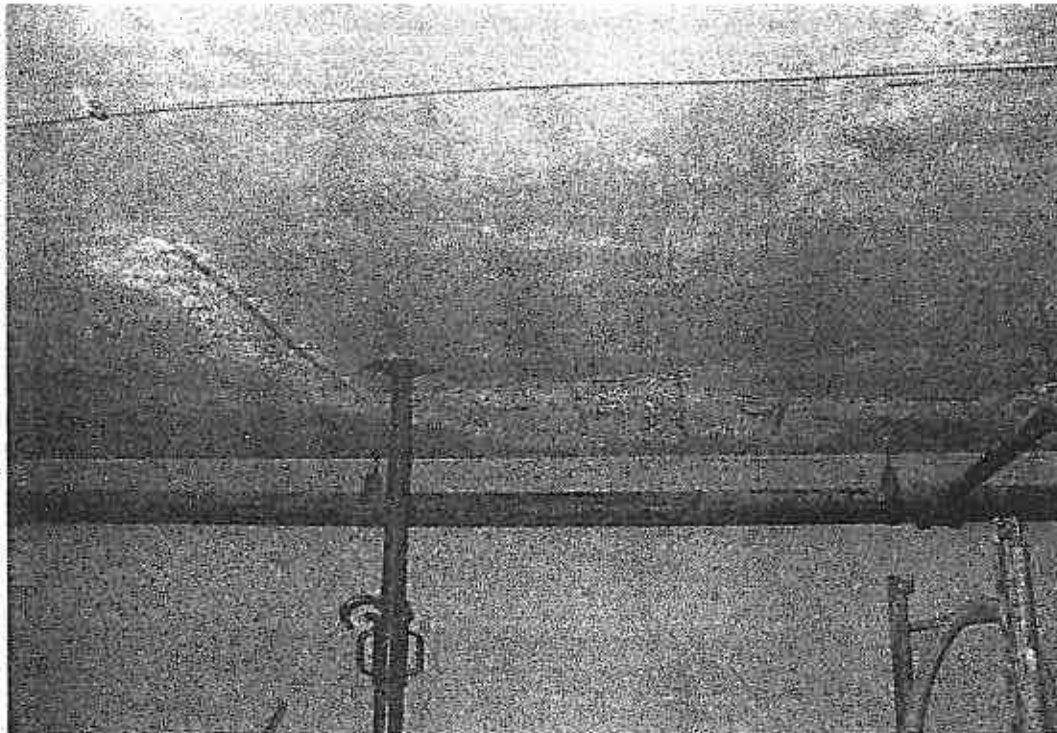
& 8 – Show typical areas being chipped of the existing delaminated concrete and preparation for repair.
